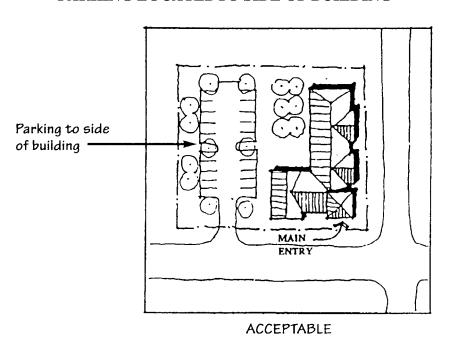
PARKING LOCATEDTO SIDE OF BUILDING
